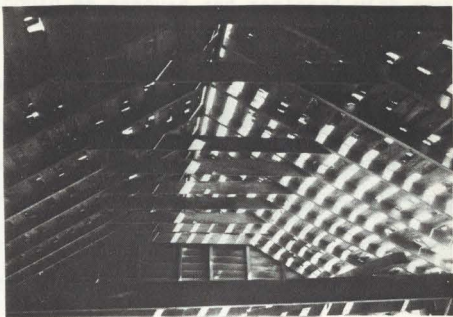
View looking up at inside of woodshed roof. Note the number of shingles that are missing.
